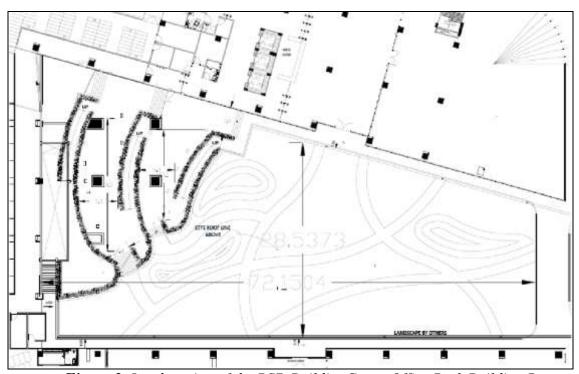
Landscaping of the BSD BuildingGreen Office Park Building B
